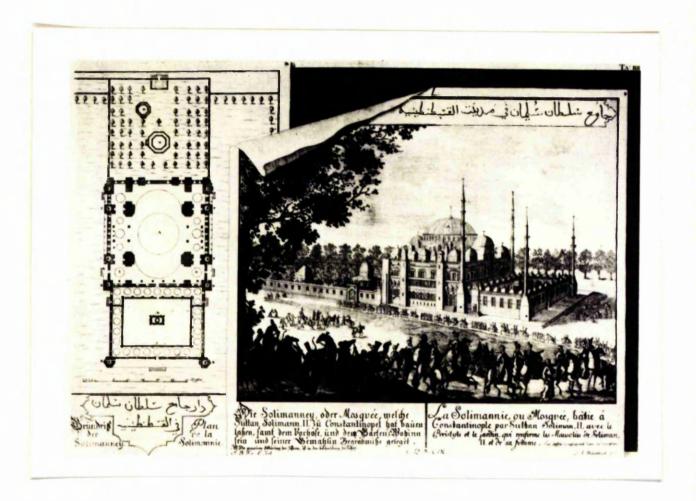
Istanbul, Suleymaniye Complex, Ground Plan and View.
